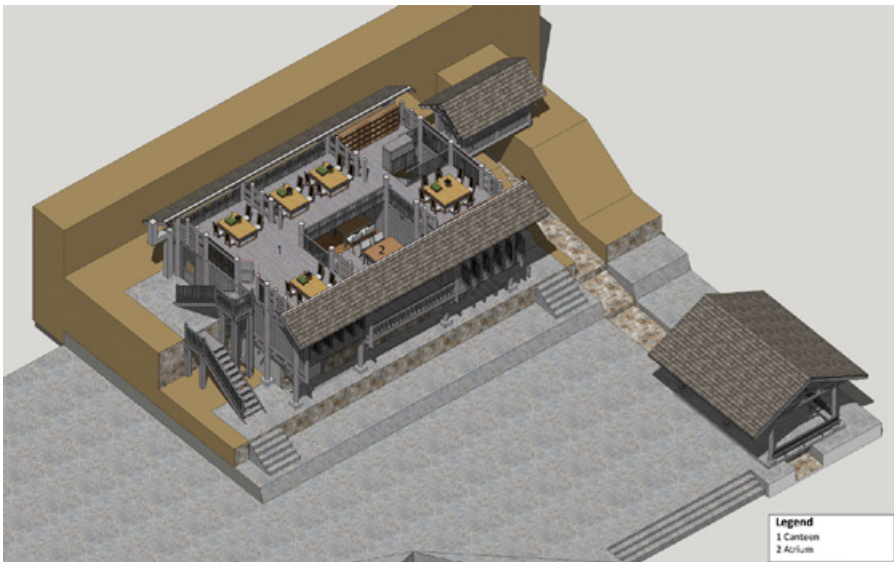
Upper floor plan of the canteen. (Source: Author)
